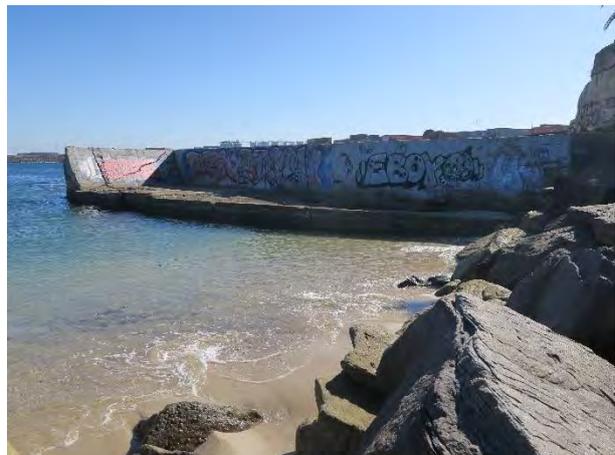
View looking south-west towards the remaining concrete funnel arm
